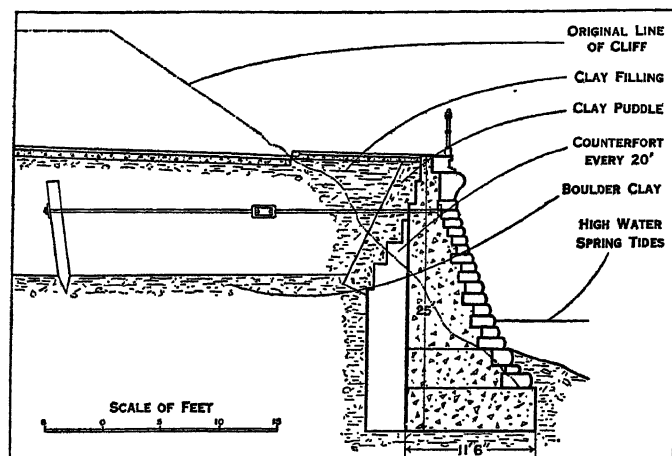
SEA WALL AT BRIDLINGTON, YORKSHIRE
